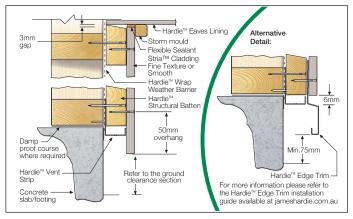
SLAB/EAVE JUNCTION DETAIL
